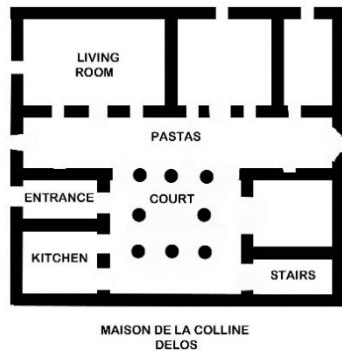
The plan of the House of Colline, 2nd century BC Mosaic floor of a house on Delos
